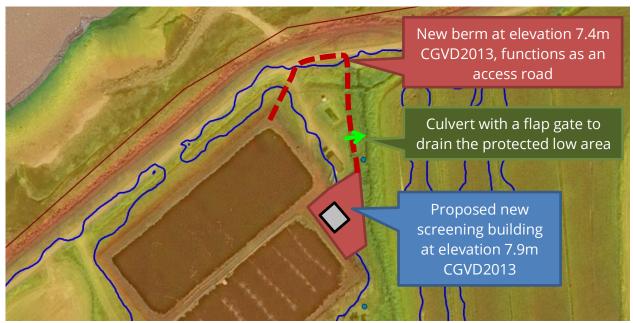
Proposed Berm to Protect WWTF Buildings
